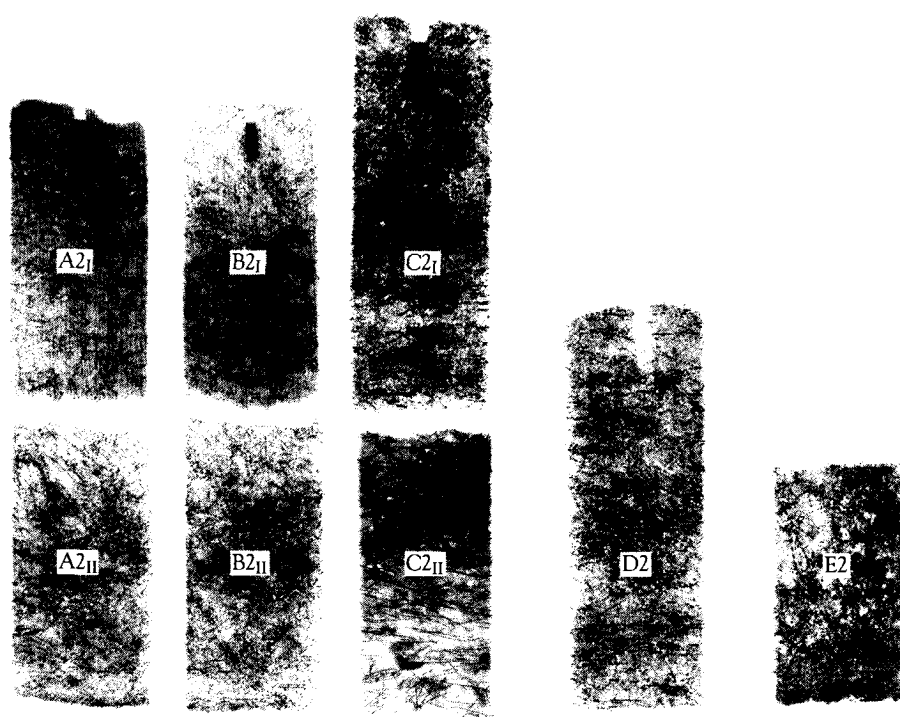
X-ray recordings of steel fibre orientation in cylinders cored from underwater concrete test slab
